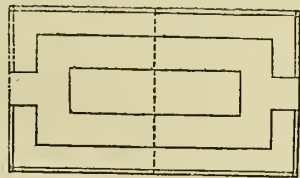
PLAN OF STAGES FOR WIDE SPAN HOUSES.
